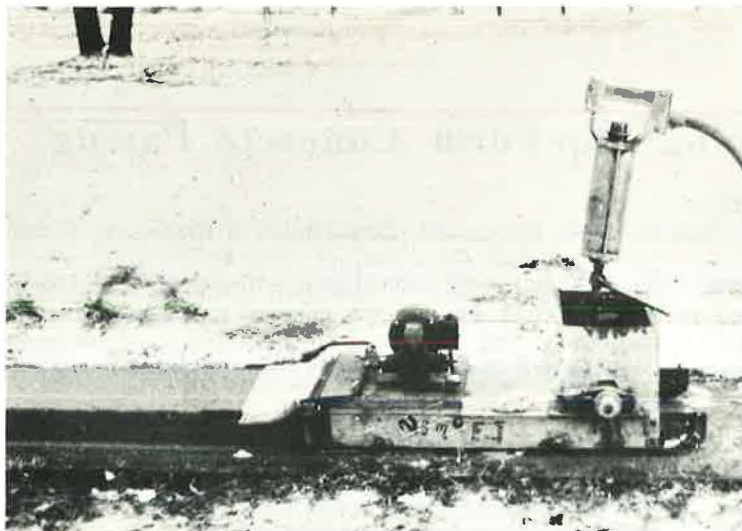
First pilot model slip-form paver; built in Iowa, 1947.
